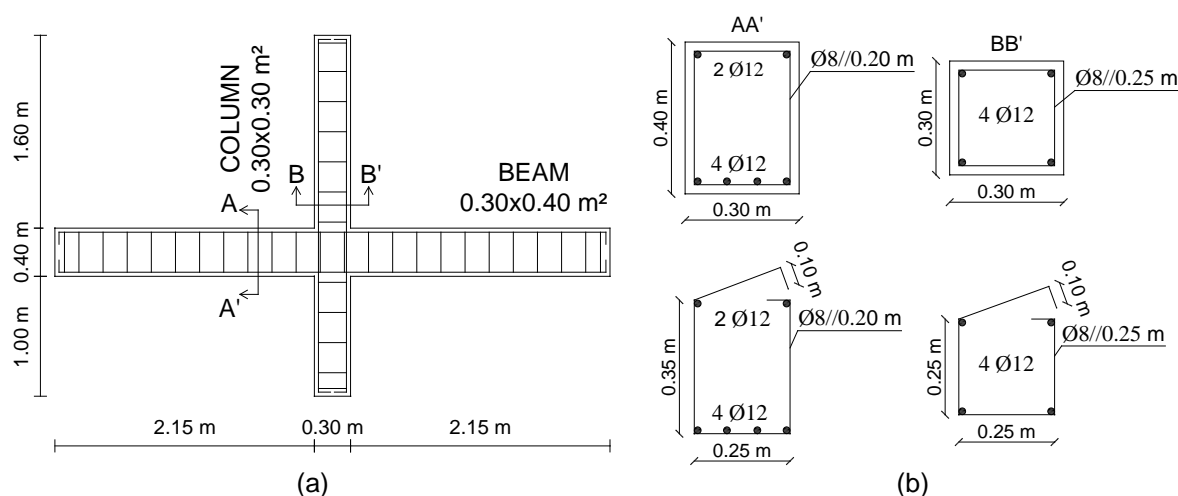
Specimens (beam-column joints): a) global geometry; b) cross sections and reinforcing steel detail.
